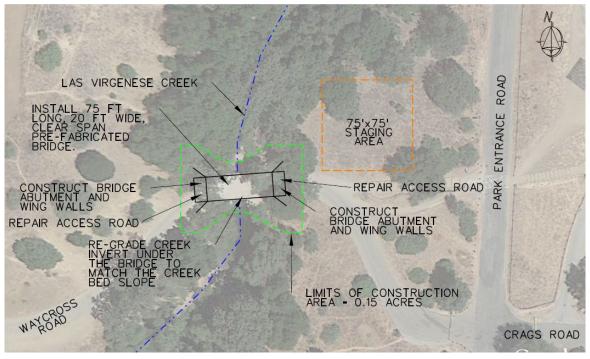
LV1, Crags Road Culvert Schematic Design Part B
